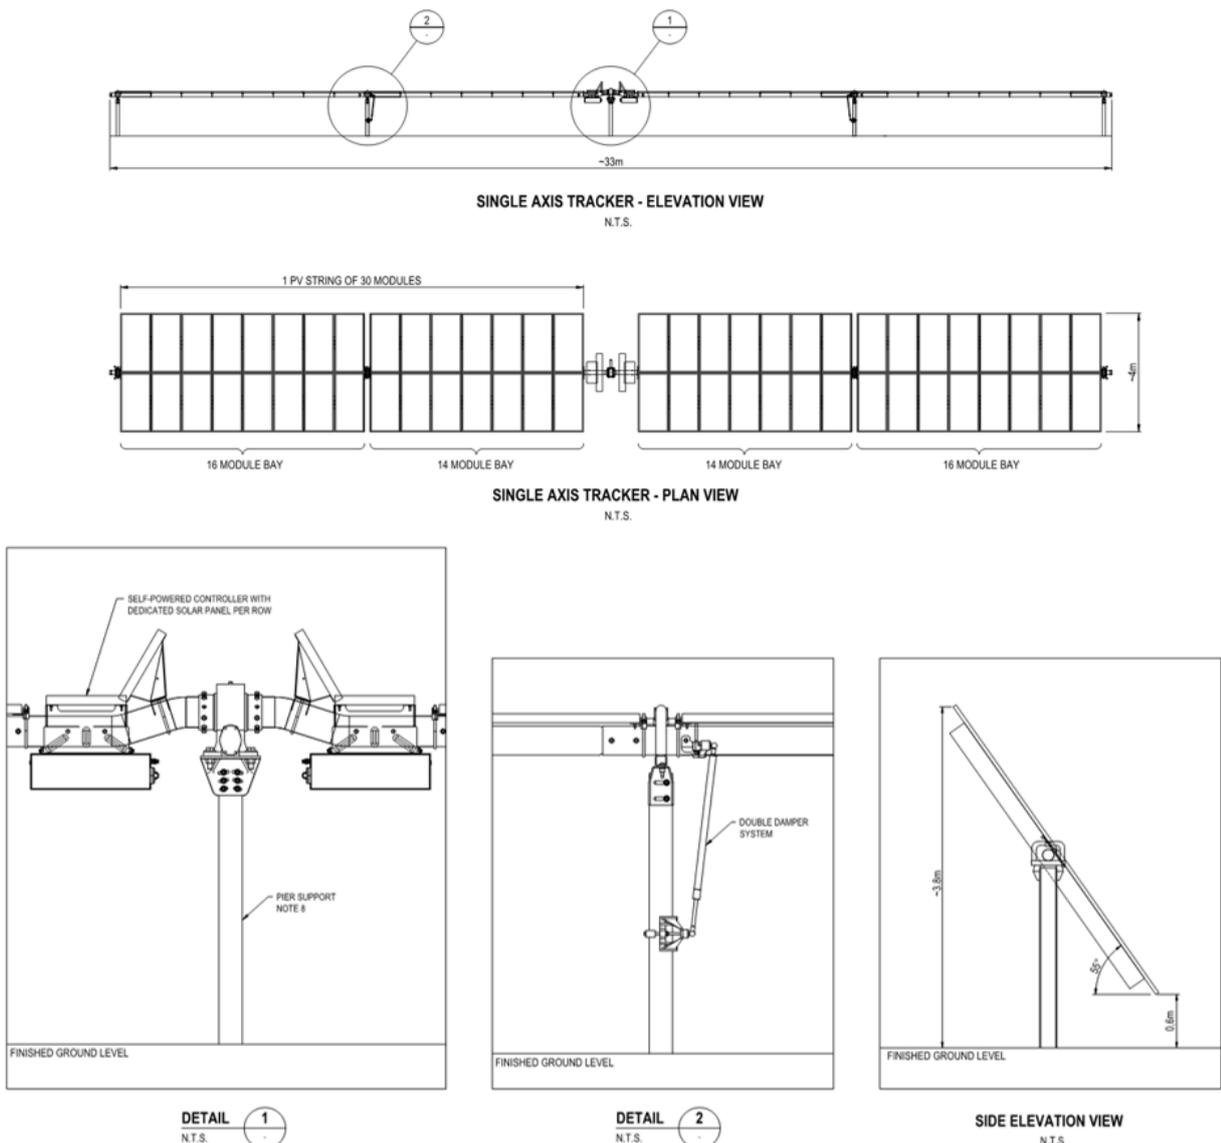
Typical Ground-mounted, Single Access Tracking (SAT) Solar Panel Layout (see Appendix B- Design Drawings for greater detail)
